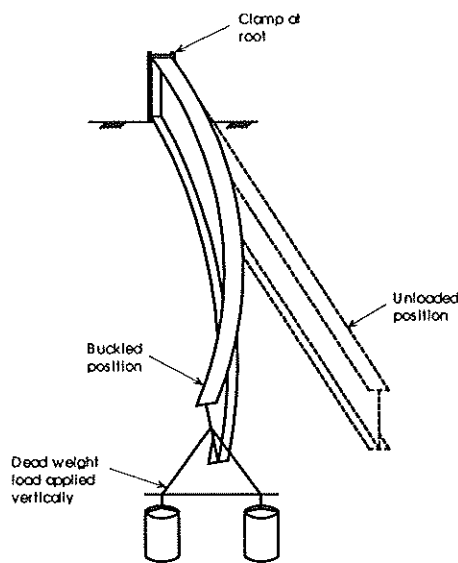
Lateral-torsional buckling of a slender cantilever beam
